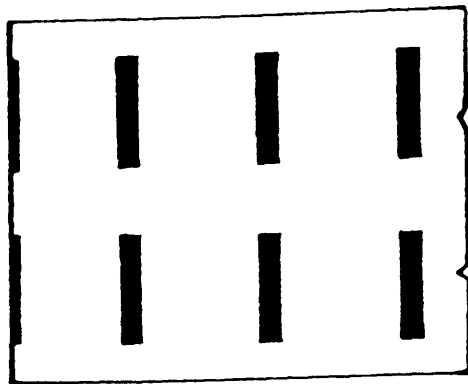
(a) shows a pictorial view of a shear wall structure and Figure 1.1(b) shows a typical (idealised) floor plan of an apartment building in which self-contained units are arranged side by side along the length of the building. This arrangement naturally results in parallel assemblies of division walls running perpendicular to the face of the building, with intersecting longitudinal walls along the corridor and facade. The cross-walls are employed not only as division walls but also as load bearing walls. The longitudinal corridor and facade walls are provided with openings for access to the living areas and balconies and for window framing. If they are also designed to be load bearing, these longitudinal walls act effectively as flanges for the primary cross-walls. In addition to its use as structural partition walls, shear walls are used to enclose lift shafts and stair wells to form partially open box structures which act as strong points in the building. Thus, in practice, shear walls of various shapes such as planar, flanged or box-shaped, may be coupled together in cross-wall structures (Figure 1.2).
